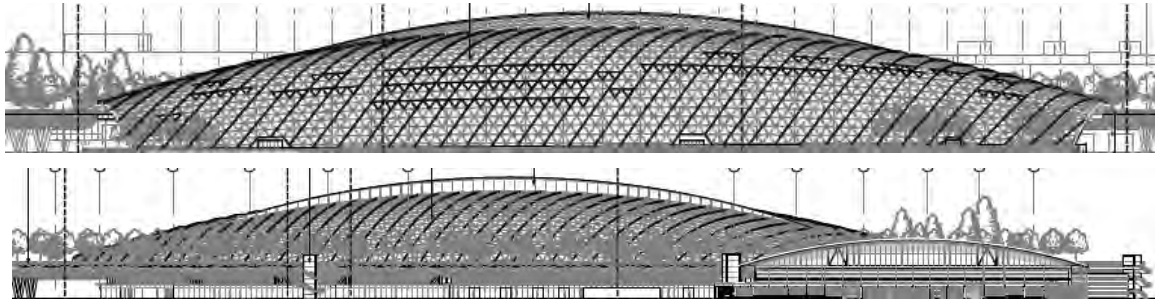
Conceptual drawings of the north façade (top) and south façade (bottom) of the atrium. Trees to be planted along the north façade are not shown.
